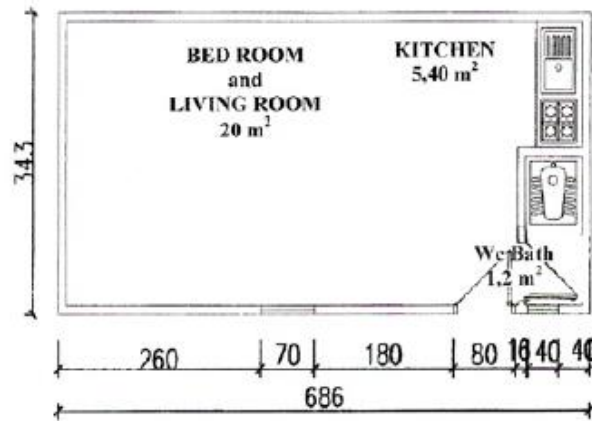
Fidanlık temporary housing plan (Source: Arslan and Coşgun, 2008, p. 707)
